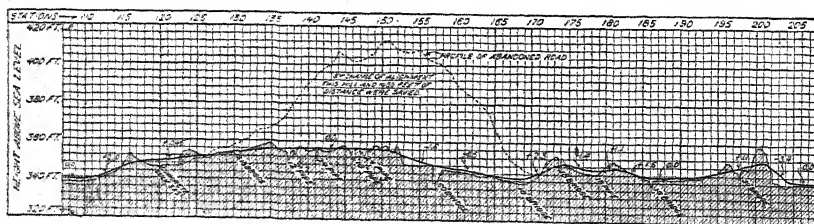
Profile of Lower Brownsville road: Figures at left denote elevation; stations numbered at the top are 500 feet apart.
